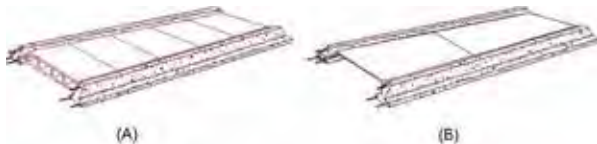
Filler block solutions for precast one-way slab. (A) conventional block; (B) proposal fiber cement block.
